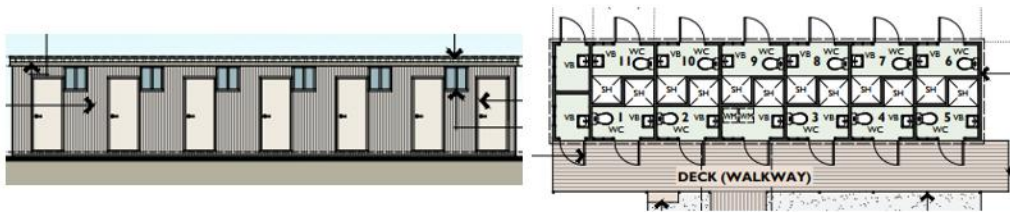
Elevation and floorplan of amenities building: *Dolphie, December 2025
